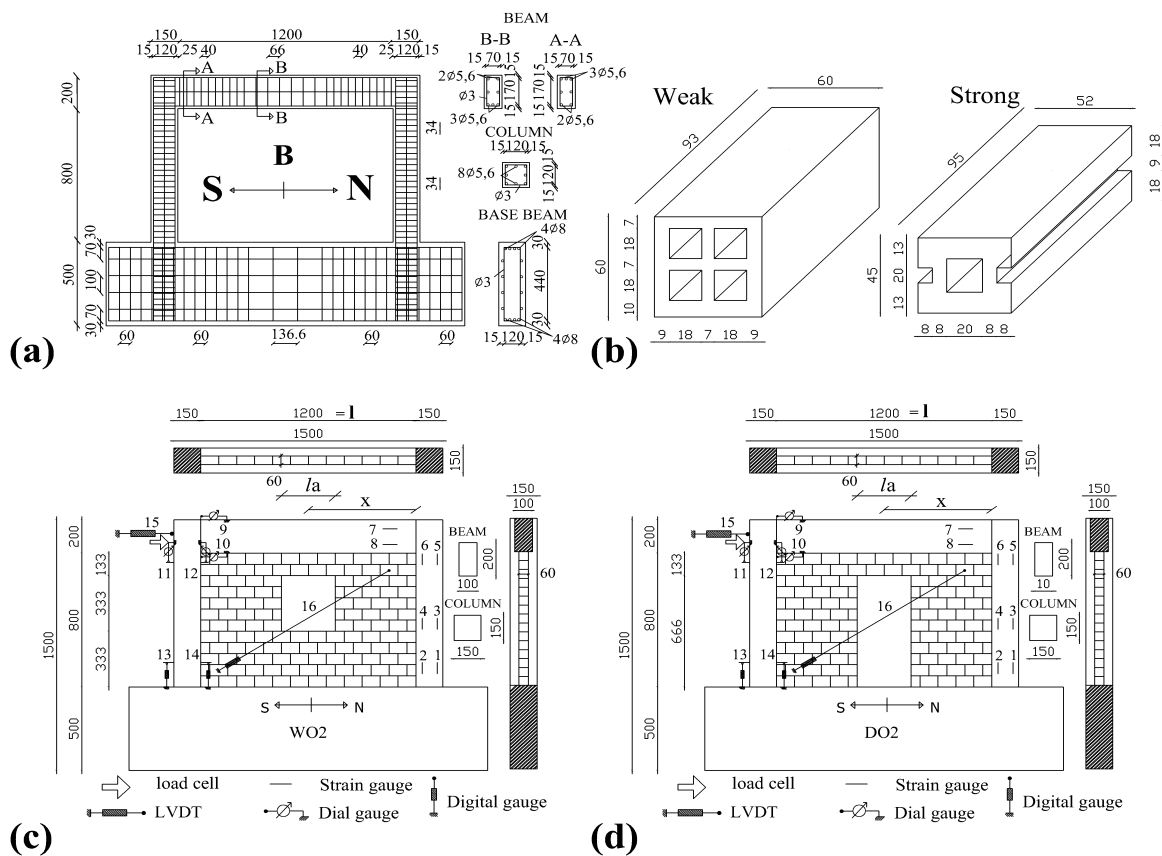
Description of infilled frame specimens and instrumentation (mm): (a) reinforcement detailing of the R/C frame model; (b) weak and strong brick units; (c) specimen with window opening and instrumentation; (d) specimen with door opening and instrumentation.
